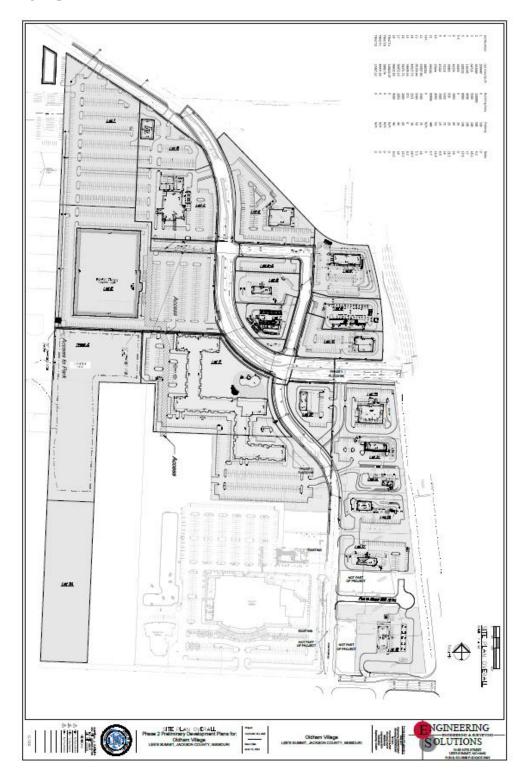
SITE PLAN: LOT AND TRACT DESIGNATIONS
